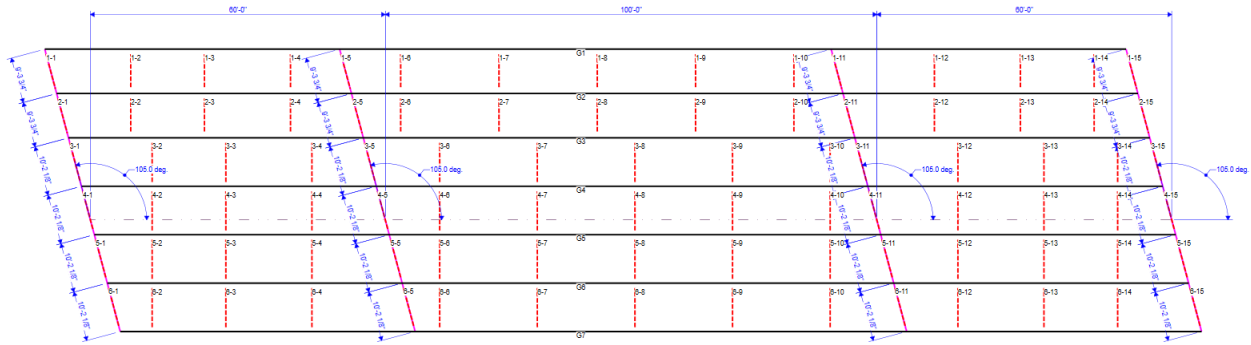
Bridge Plan View for S080 40375 (AASHTOWare™ BrR, 2023)
